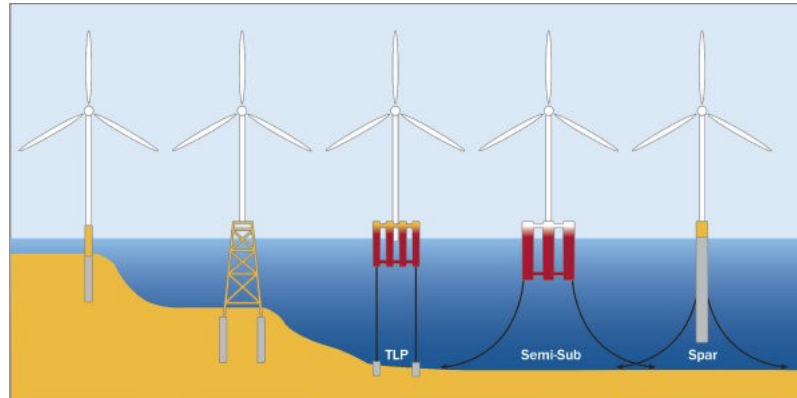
Examples of fixed and floating foundations (Bailey et al. 2014).
